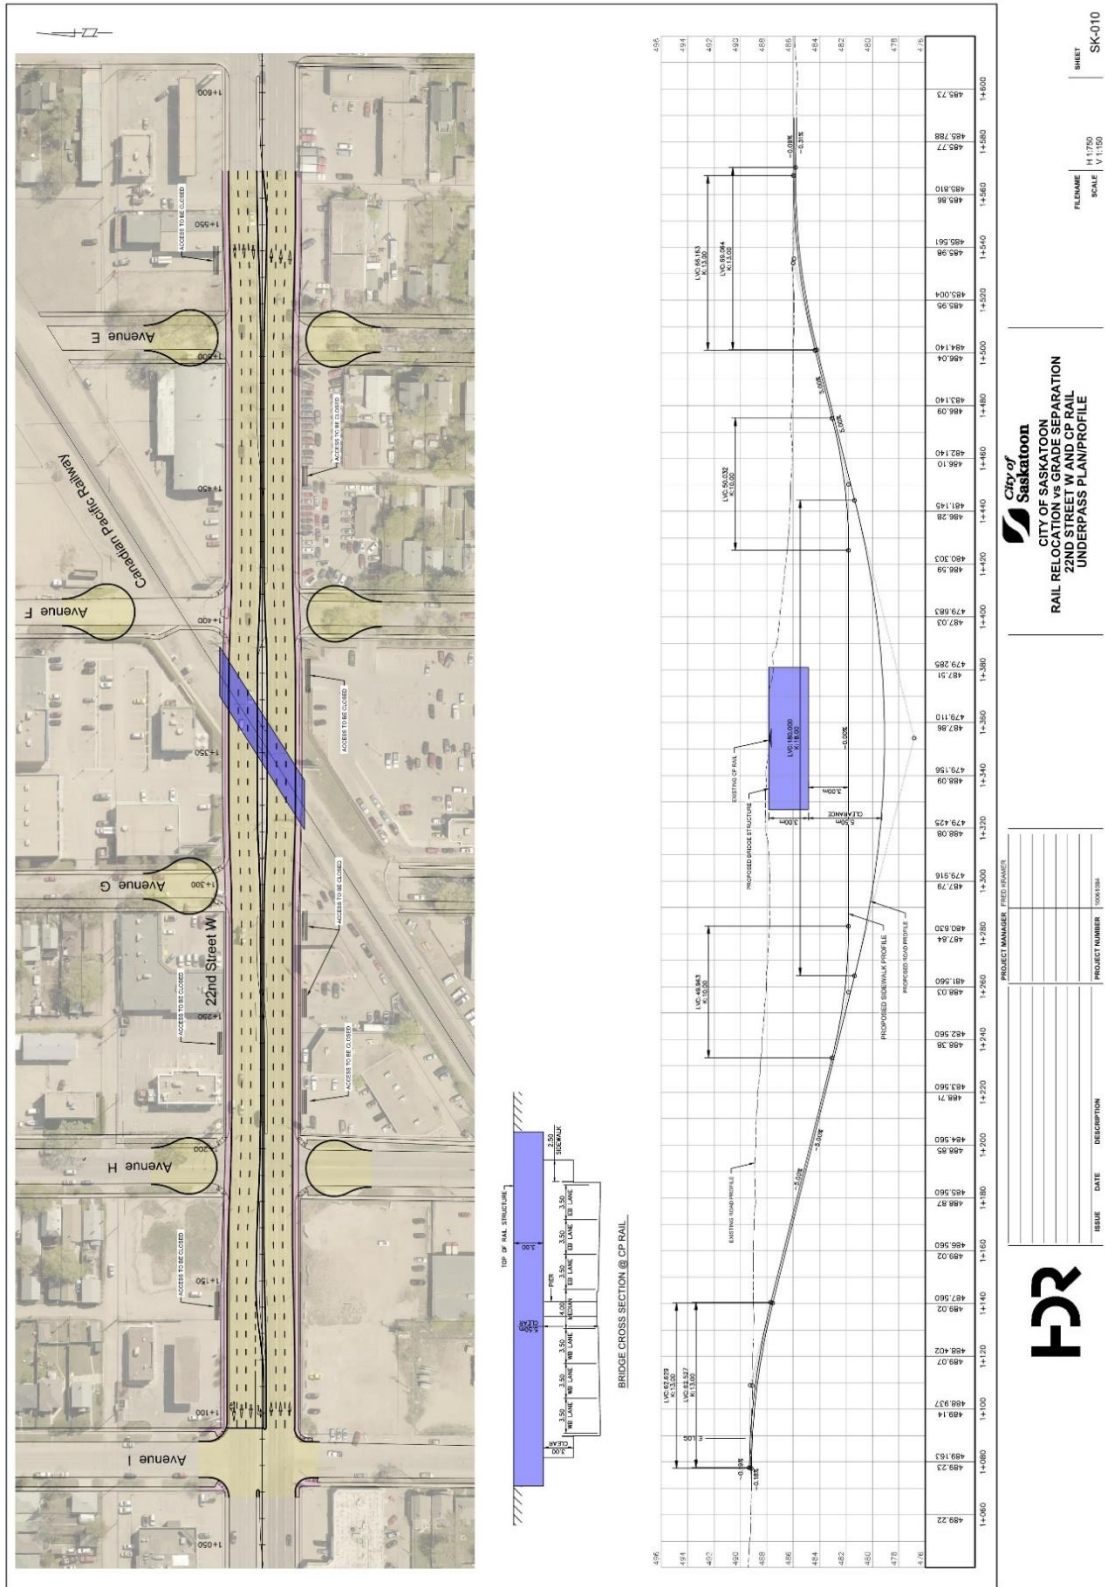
Proposed Conceptual Plan and Profile for 22nd Street W @ CP
